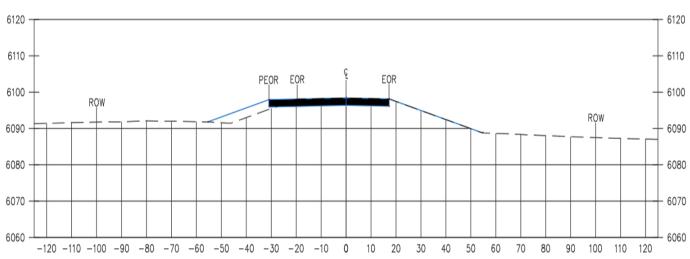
Civil 3D generated Station 62+00 Cross-Section/ Road Centerline, Right of Way, Edge of Shoulder, with Existing Edge of Road, and Proposed Edge of Road
